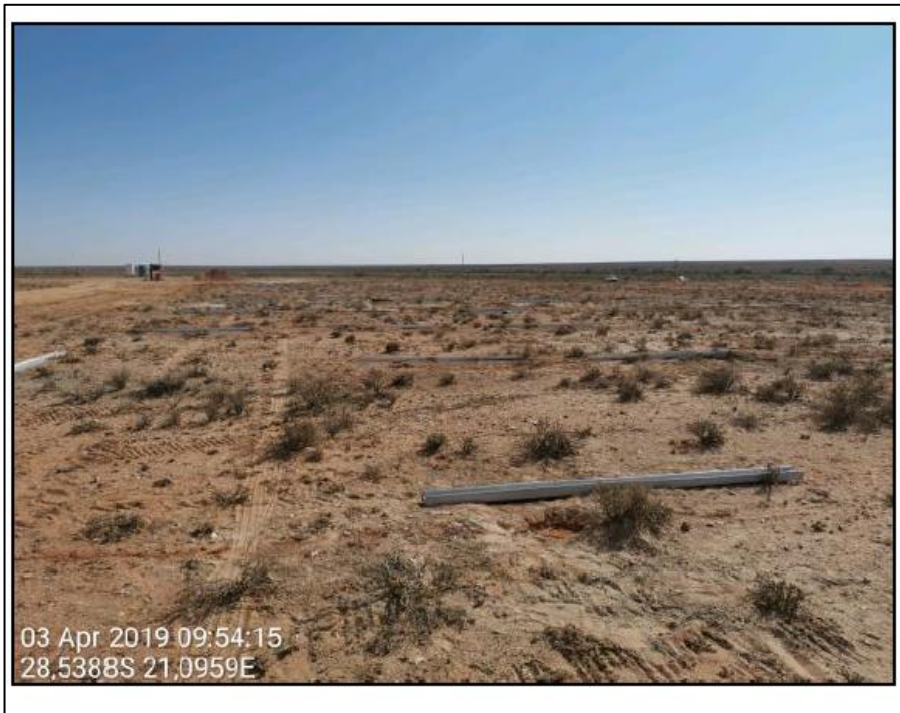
pre-drilled holes are backfilled with a wet sand mixture and steel piles placed in position ready for ramming.
